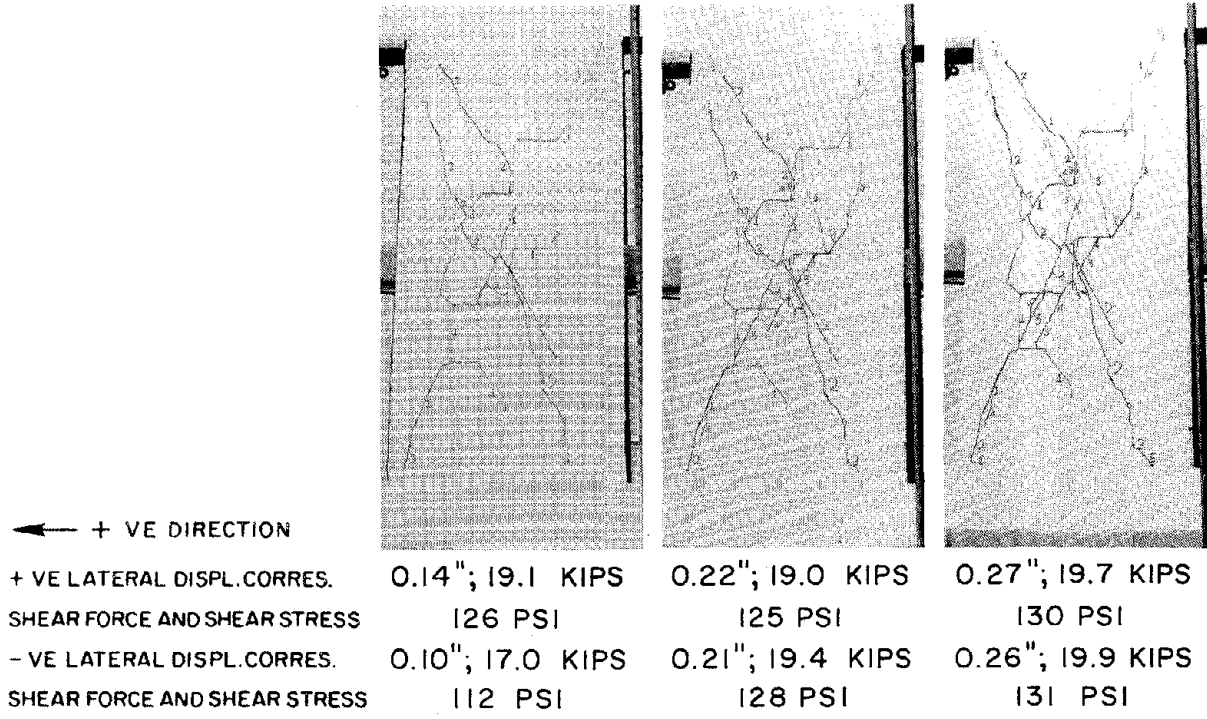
SUCCESSIVE CRACK FORMATION TEST 12. (RIGHT SIDE PIER)
